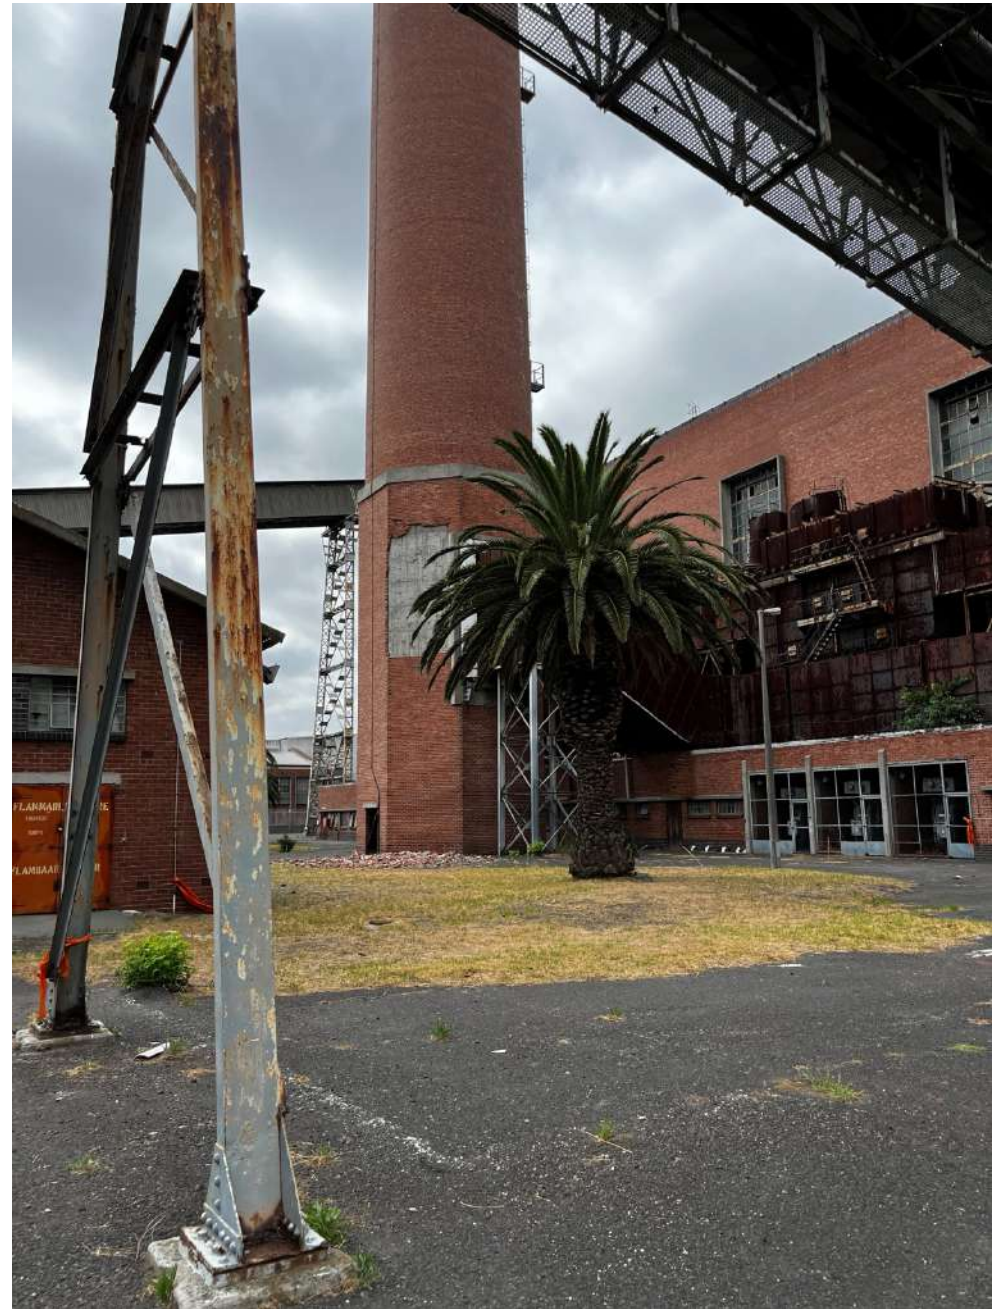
Chimney stack 2 with Ash conveyor overhead – note clad brick failure on chimney stack (Hearth, 2025)
